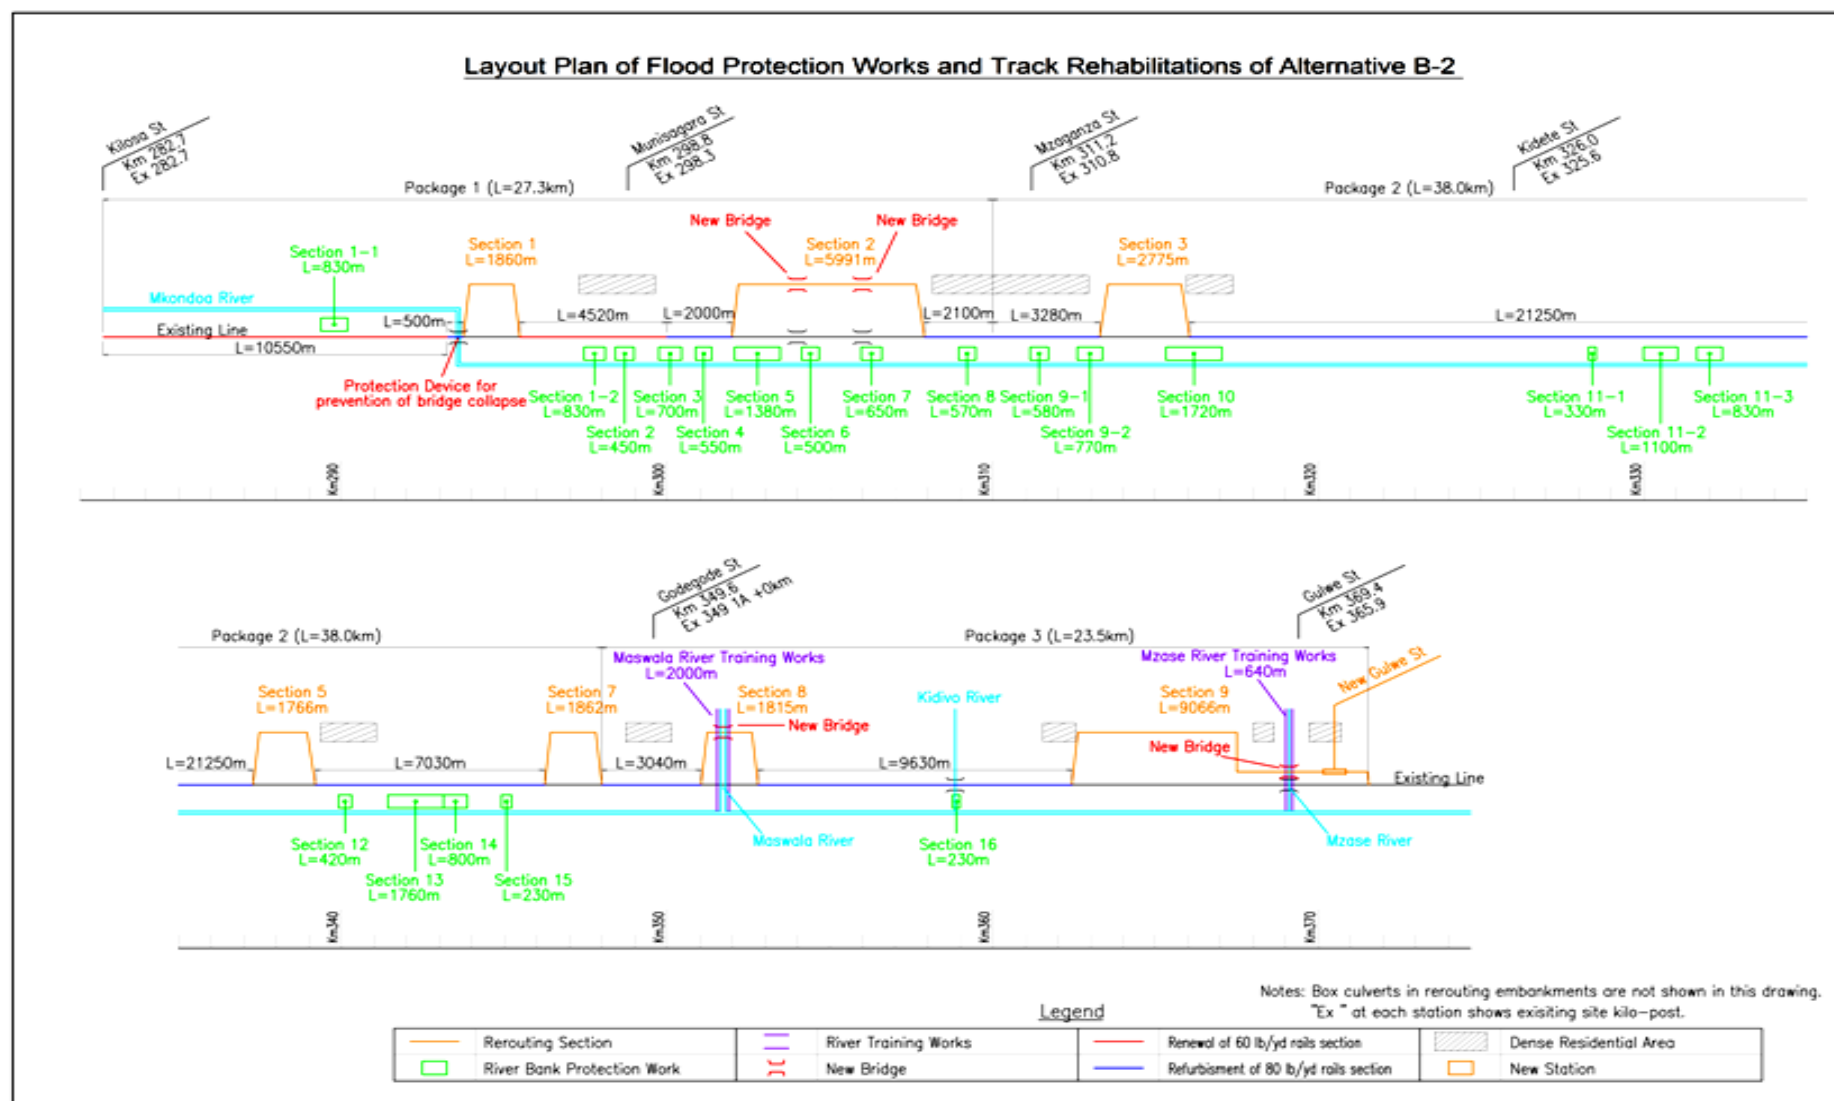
Layout plan of flood protection works and track rehabilitation of alternative B-2
